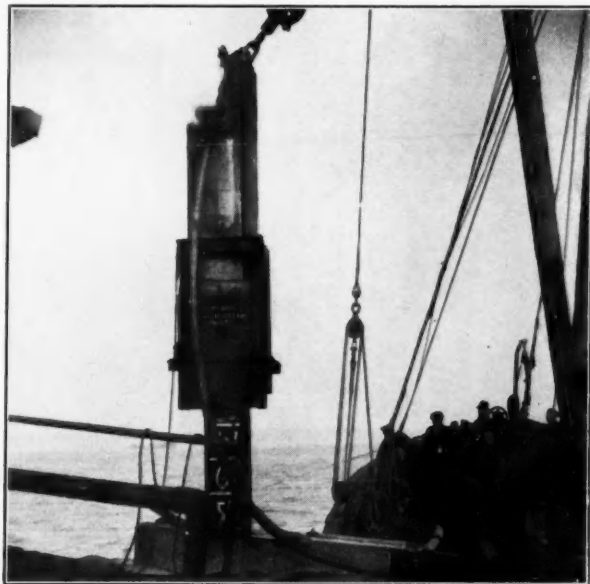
Driving No. 4 Rendhex pile from vessel, using 10B3 McKiernan-Terry double acting piling hammer.
